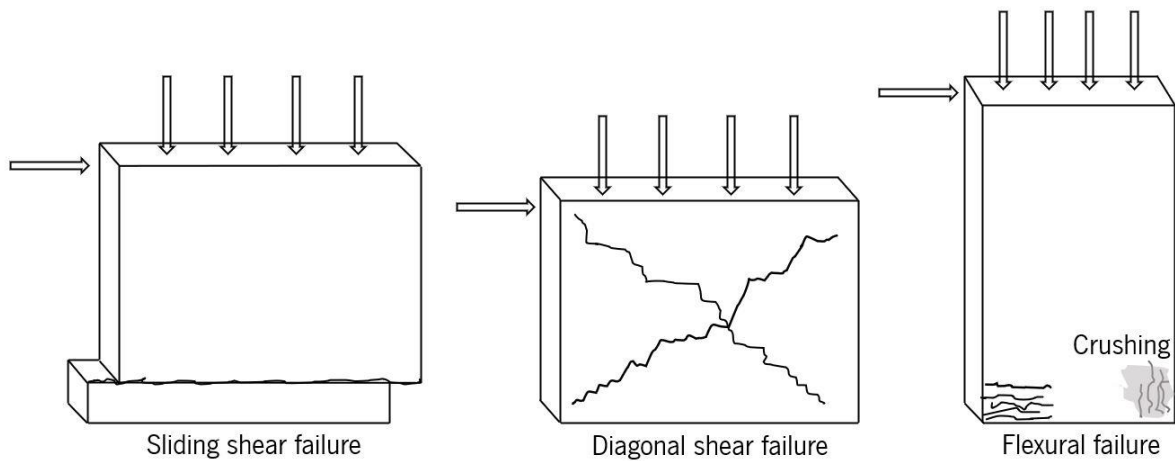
In-plane failure mechanisms of masonry subject to combined vertical and horizontal loading
